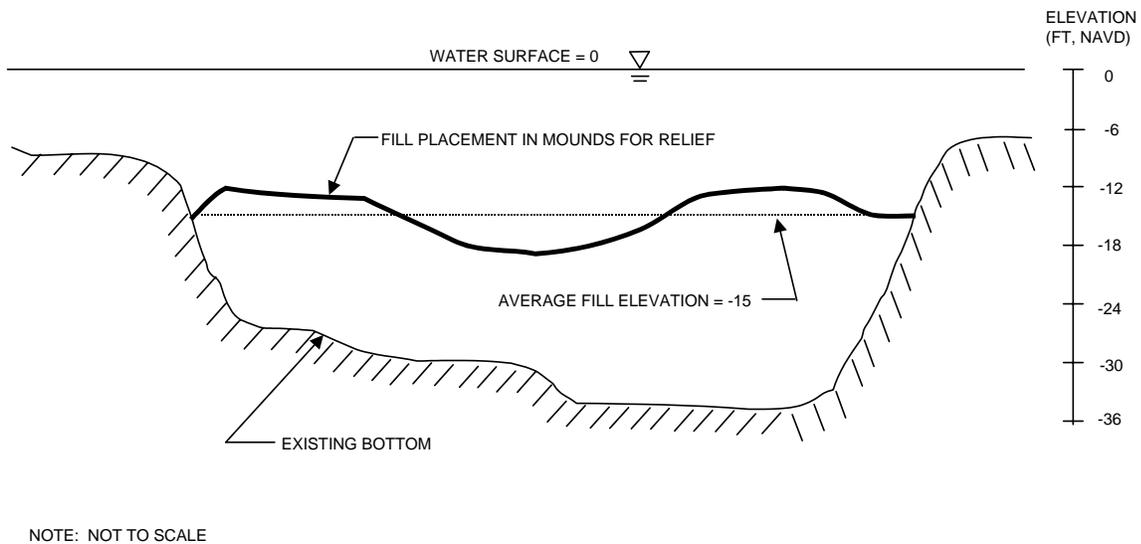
Schematic Cross-Section for Filling of Dredged Hole #6 to -15 ft.
